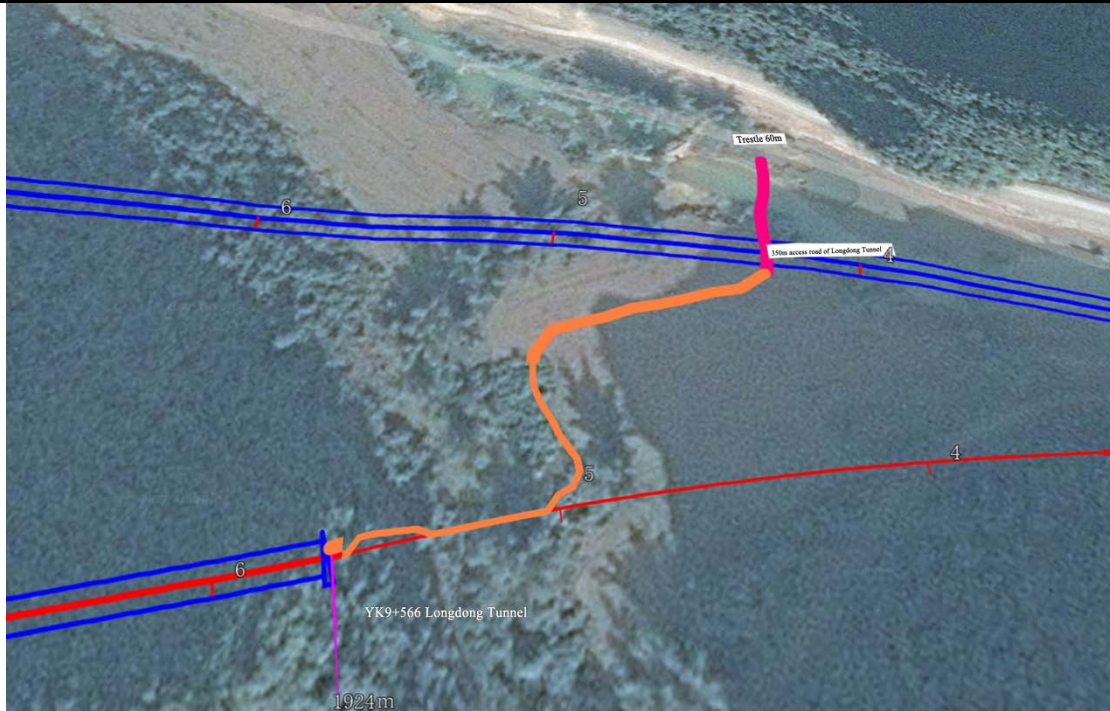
Location of New Access Road at Entrance of Longdong No.1 Tunnel
